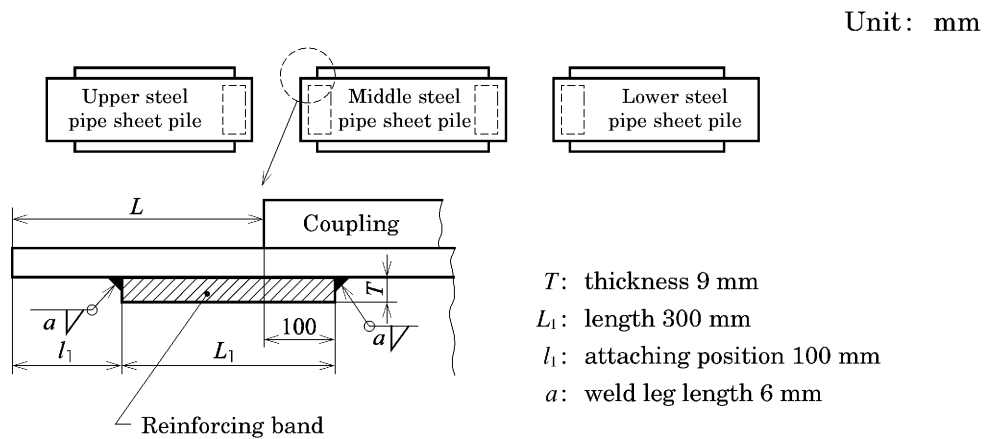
Example of shape and dimensions of reinforcing band for prevention of deformation
